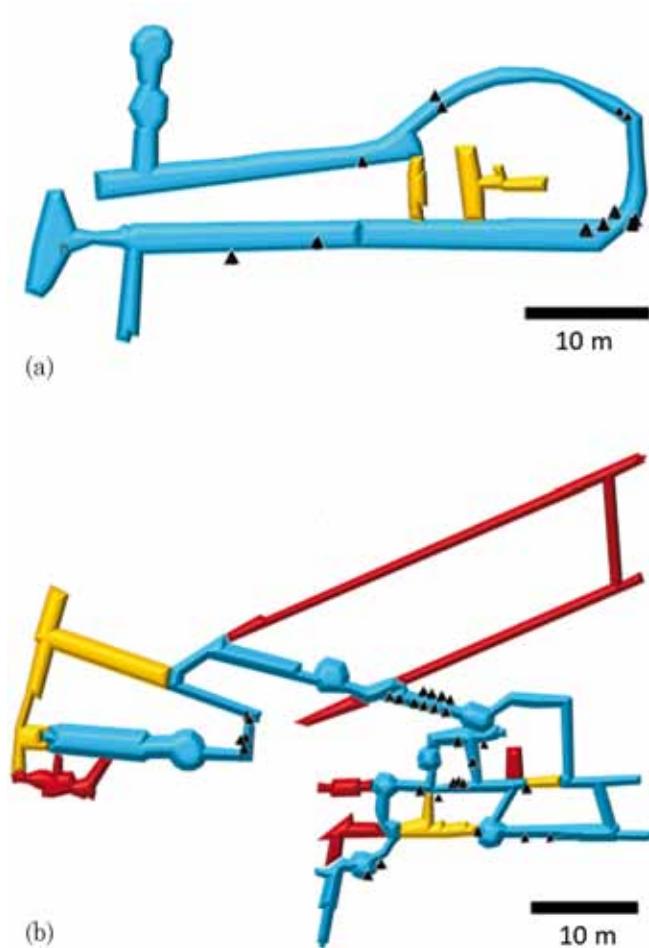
Locations of cracks: (a) 1st floor, (b) 2nd floor. Triangle symbol indicates cracks (elaboration: Sakane).
